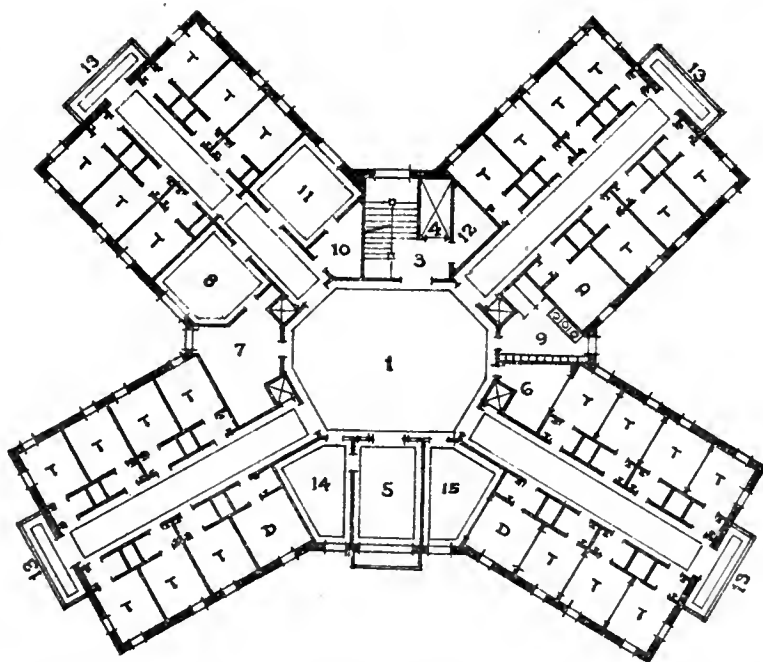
Second floor plan of eighty-five bed hospital: 1, general rotunda; 2, service dumbwaiters; 3, elevator and stair halls; 4, elevator; 5, sick babies' room; 6, milk laboratory; 7, work room; 8, nursery; 9, toilet room; 10, work room; 11, delivery room; 12, wheel chairs and carts; 13, solariums; 14, bath room for babies; 15, dressing room for children; 16, typical room; 17, double room and utilities; 18, bath room for babies; 19, dressing room for children.
